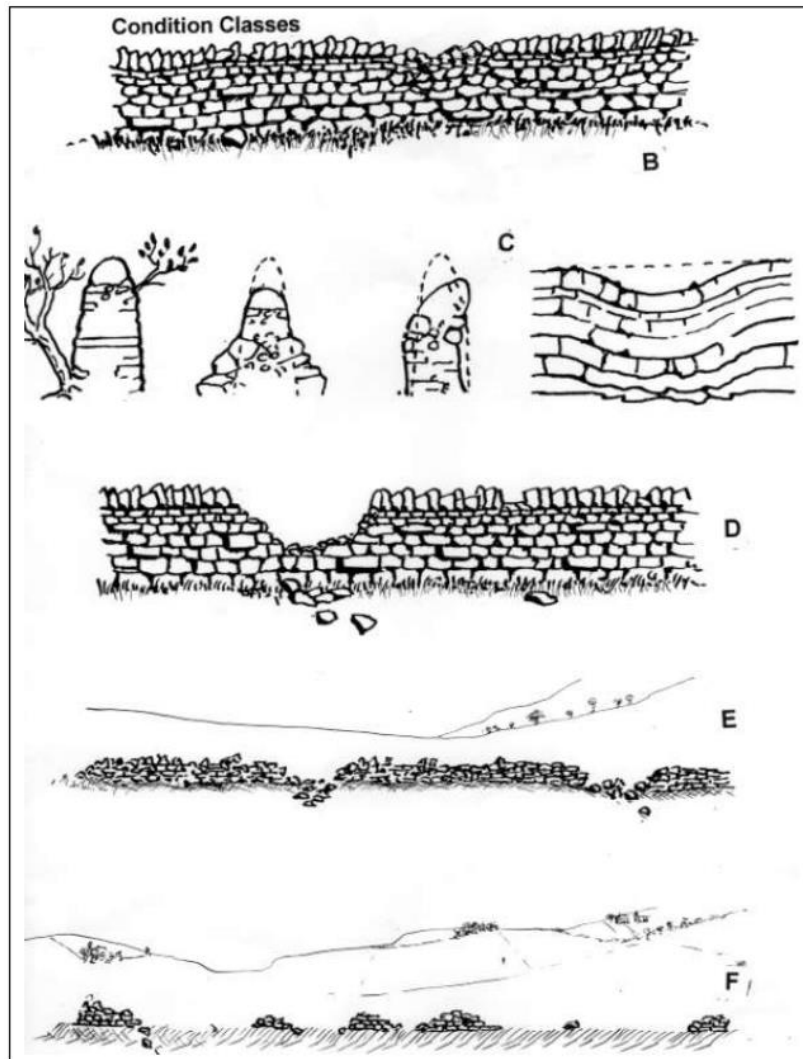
A segment from a 'wall survey' sheet, which is used in Great Britain to conduct surveys on walls' conditions (B. K. Jones 2000)
